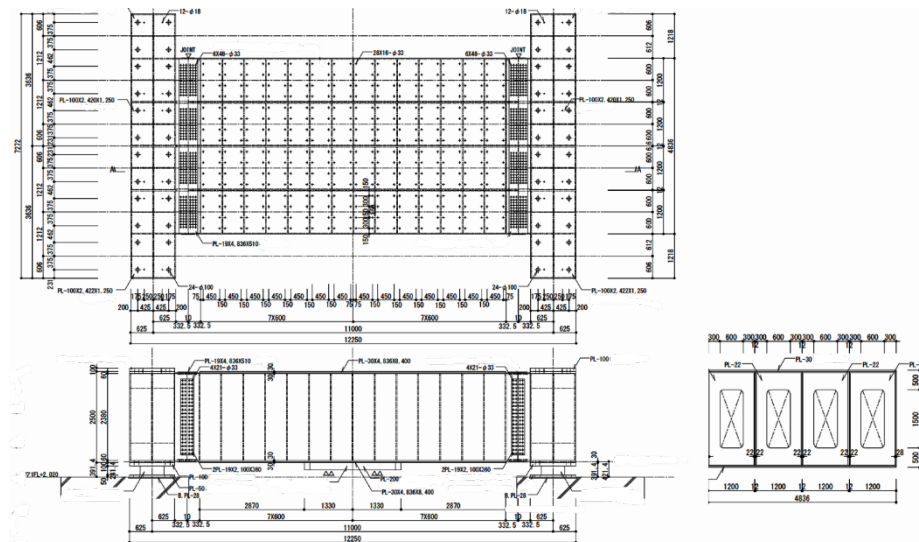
Plan and section of reaction beam (Courtesy of Nippon Steel Engineering and Dr. Hidemoto Mukai)
